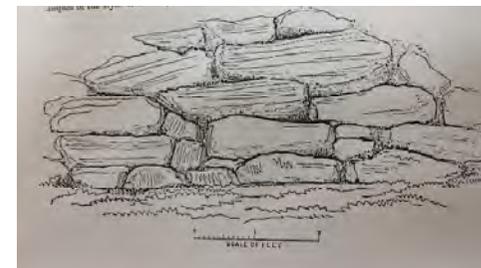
Original masonry on the external wall face, drawn by George Du Noyer, *OS Memoir* 1837
